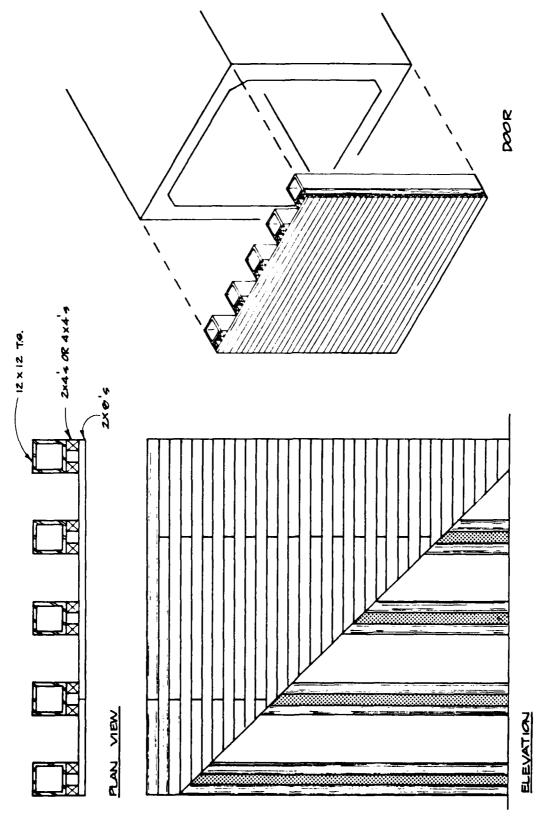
Typical Closure for a 10 ft by 10 ft Box Culvert For 40 psi.
